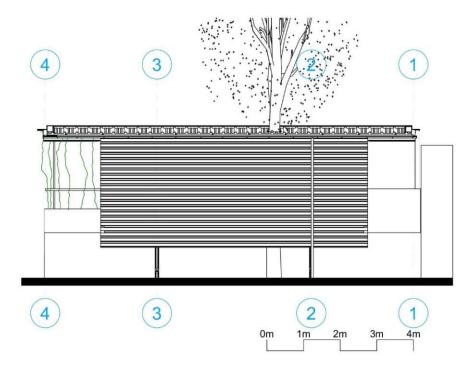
Elevation East M1:100. Profiled sheeting is used as paneling.
